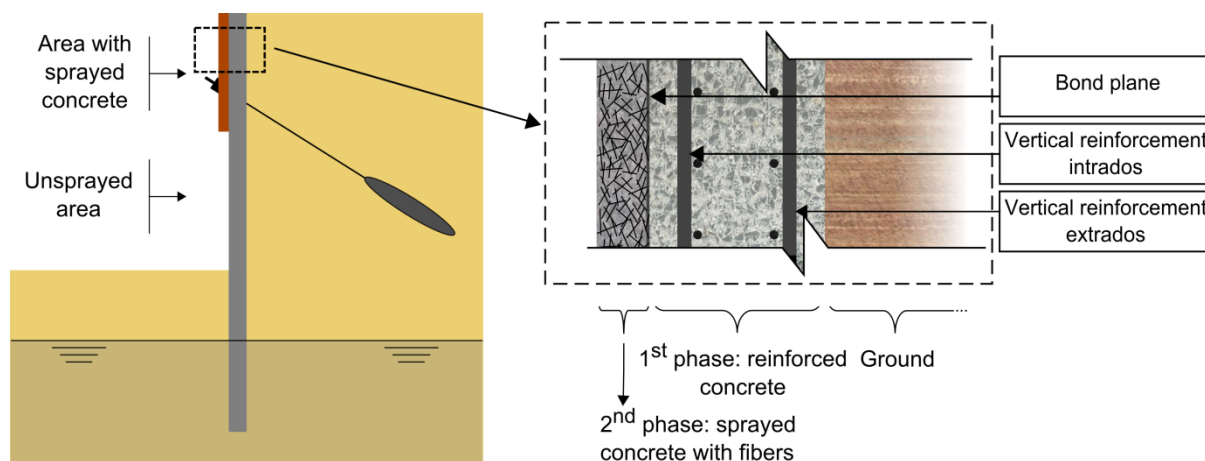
Sketch of bi-layer wall: general and sectional view.
